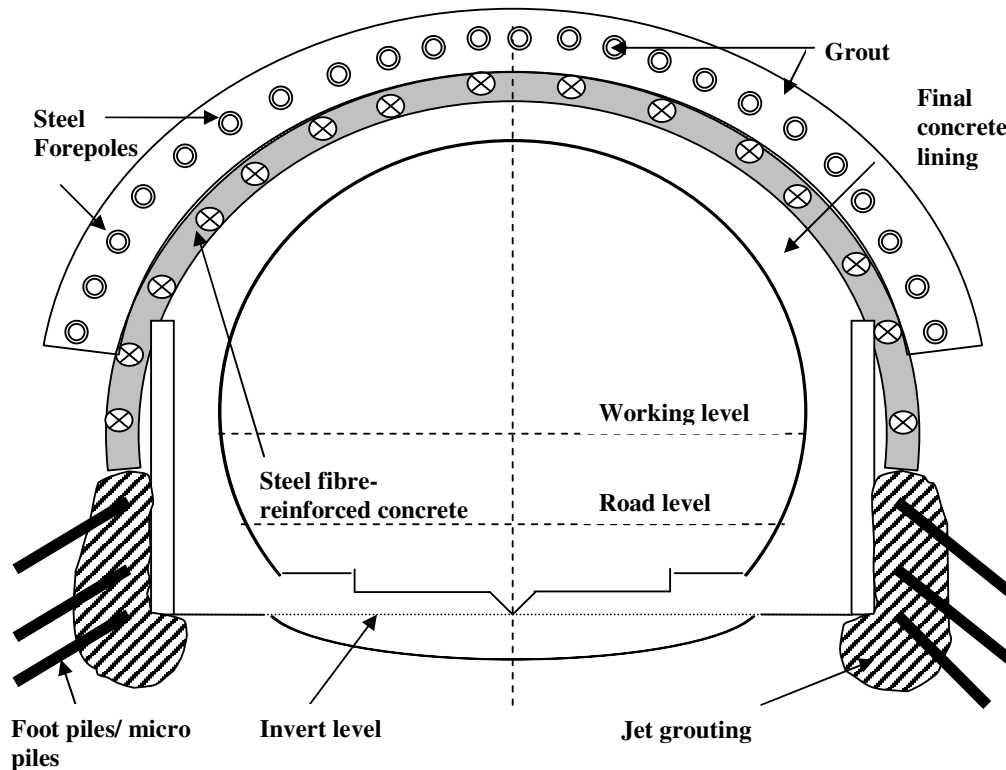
Support measures for a typical tunnel in weak ground constructed by NATM method.
